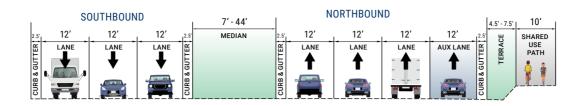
Preferred Alternative for the County CV/Anderson Road Intersection
